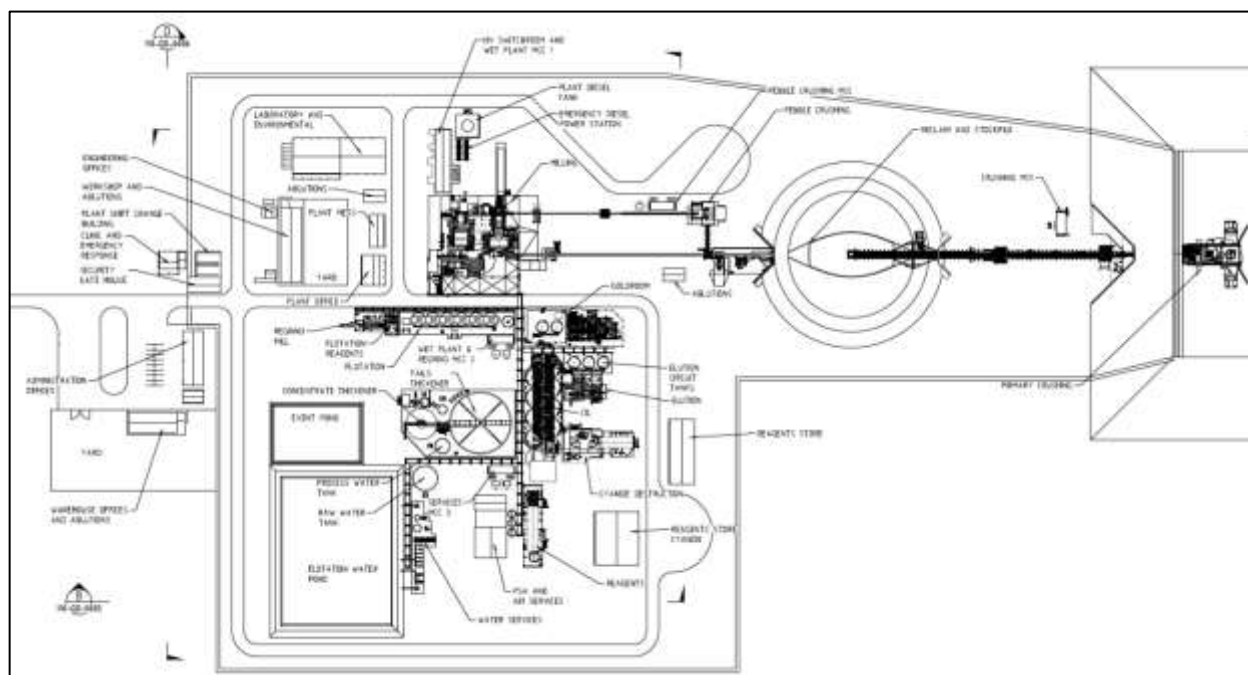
Proposed plant layout (source: Lycopodium, 2018, 2006-110-GD-004_A)
